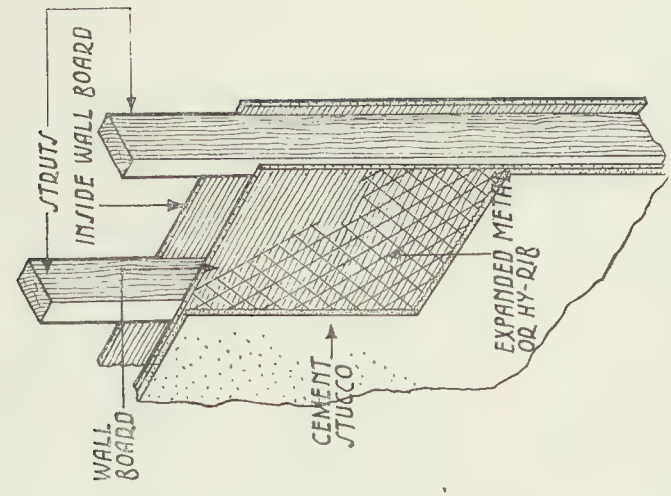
DETAIL OF EXTERNAL FINISH TO TIMBER FRAMING
